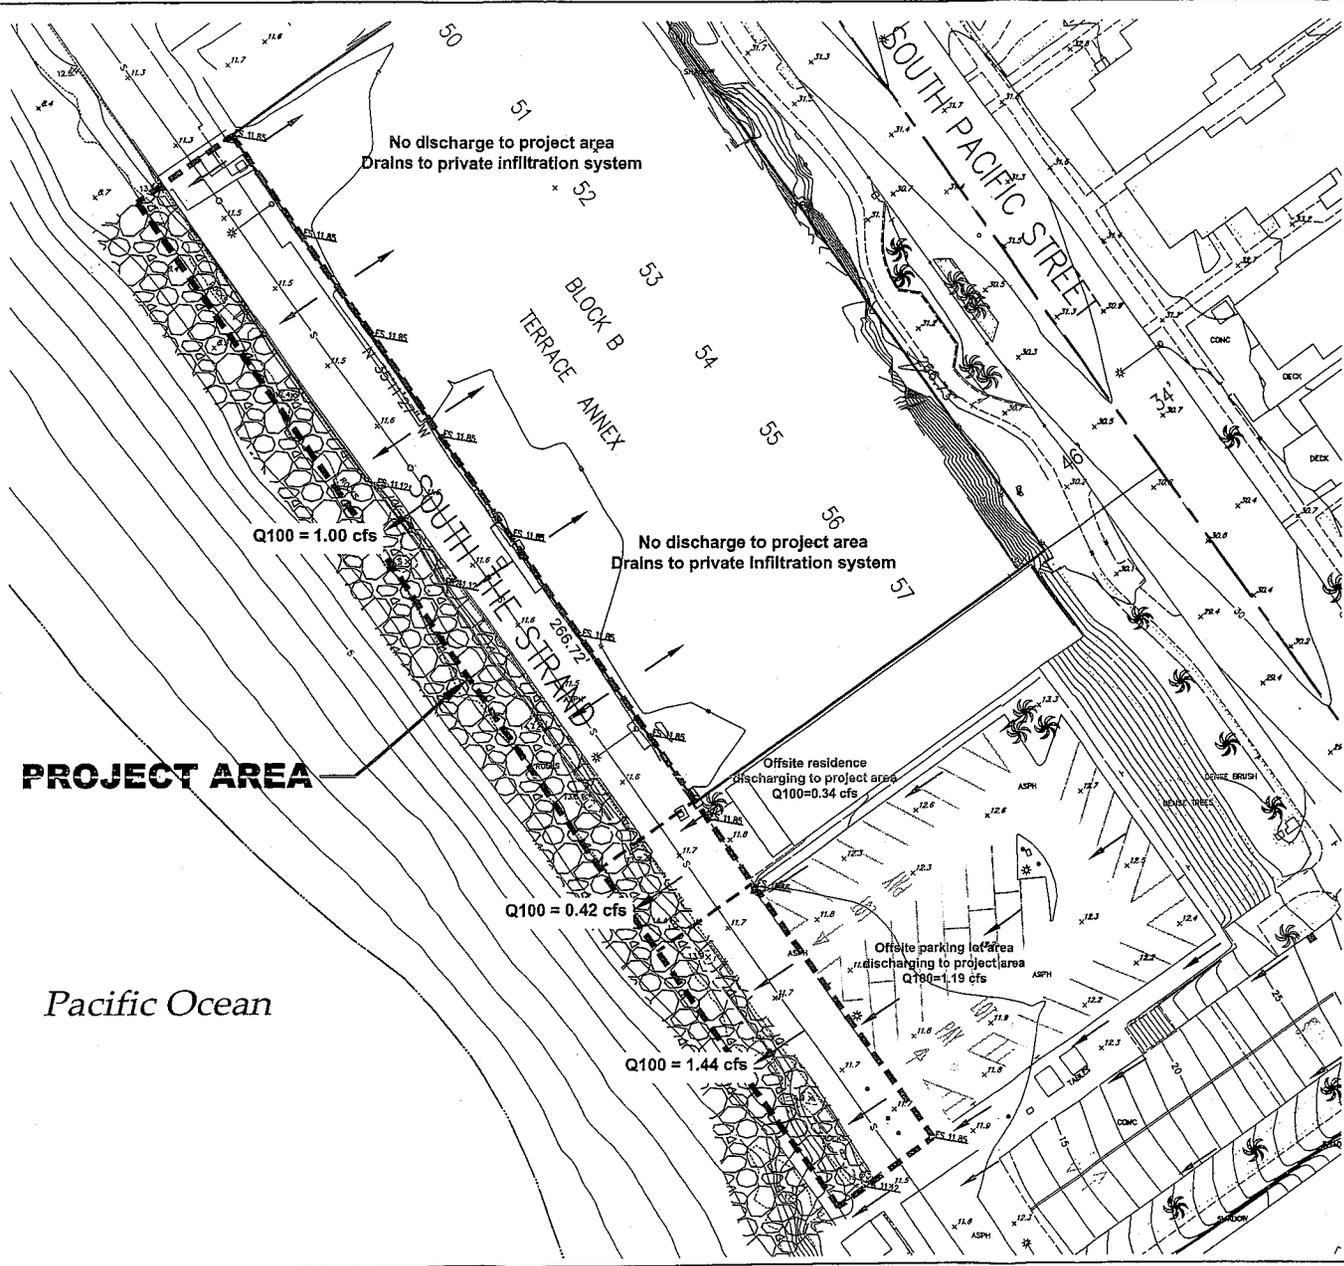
EXISTING CONDITIONS SITE PLAN AND DRAINAGE PATTERNS
